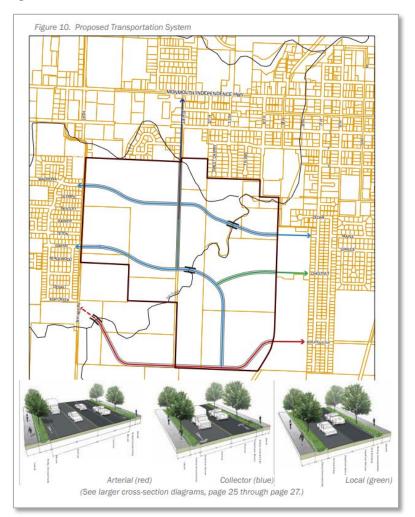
Proposed SW Independence Concept Plan Transportation System¹⁰
